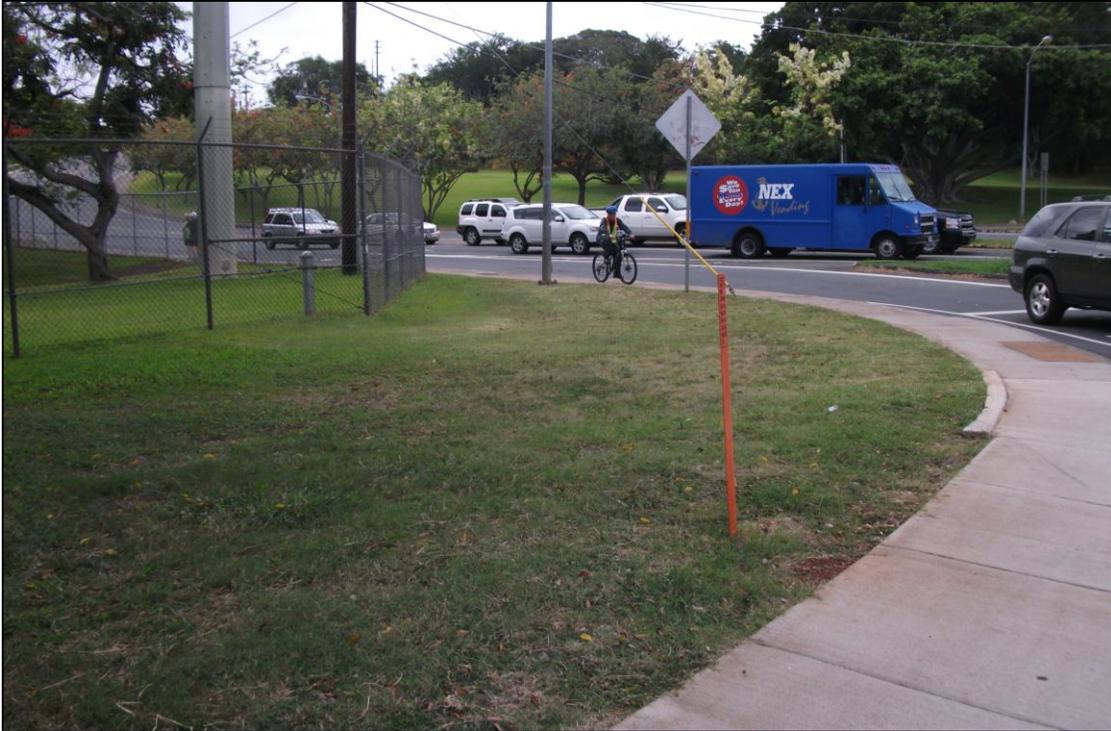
General view of proposed excavation at a utility relocation 1043+90 at the northeast corner of Kamehameha Highway and Radford Drive, view to southeast
